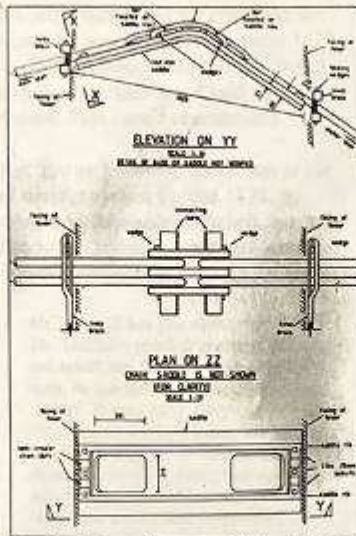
Gatonside tower-saddle detail, 1991 (Travers Morgan)
